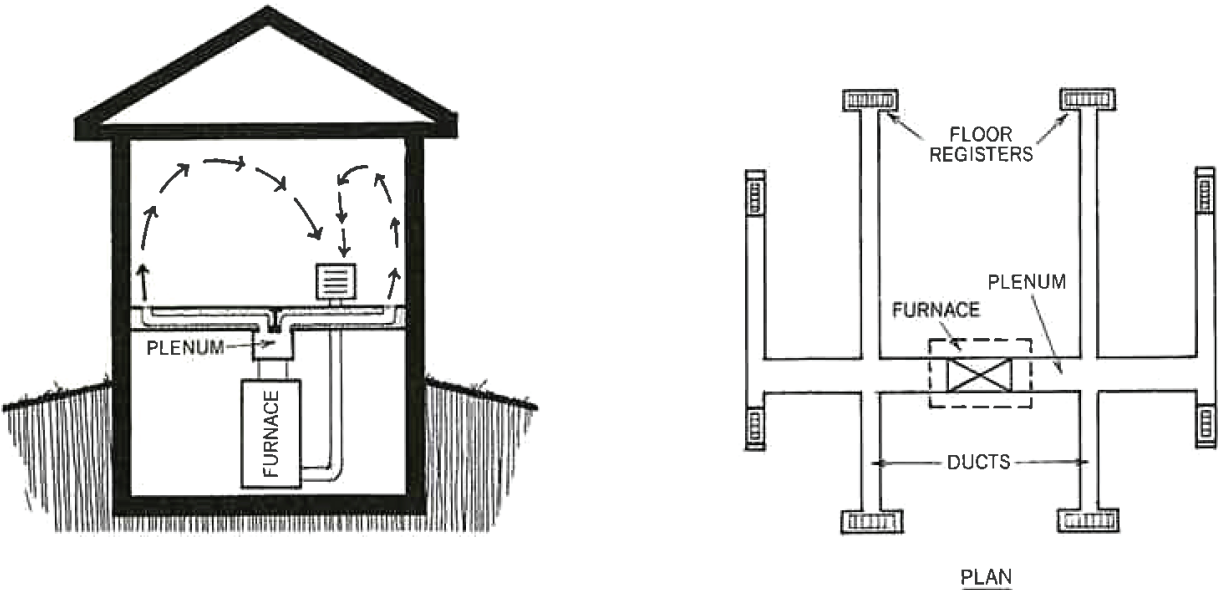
The extended-plenum system for basement construction has the supply ducts run between joists to save on headroom.
